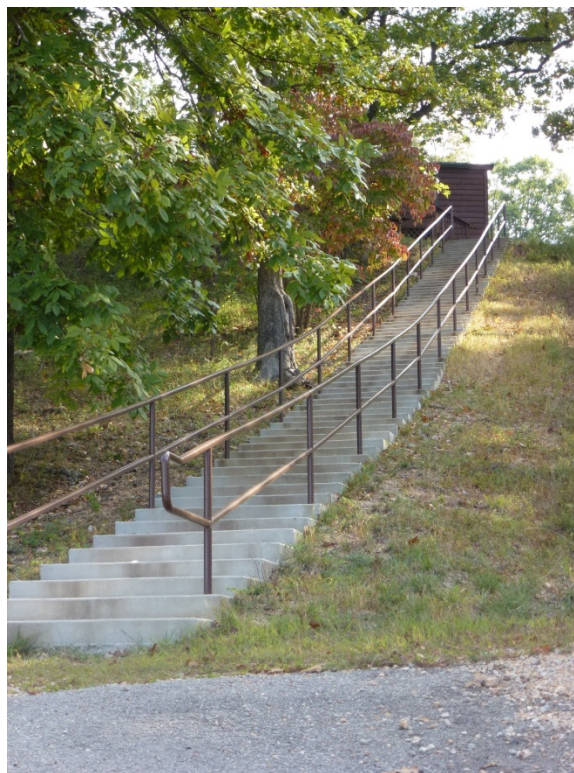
Newer concrete sidewalk with metal handrails that leads from the paved parking lot near the marina to Building 528 and the marina (ERDC-CERL, 2015).
